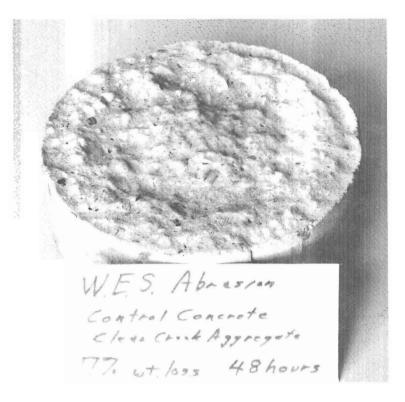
Typical surface condition of a tested specimen – conventional concrete after 48 hours of testing. Photo P801-D-80923
